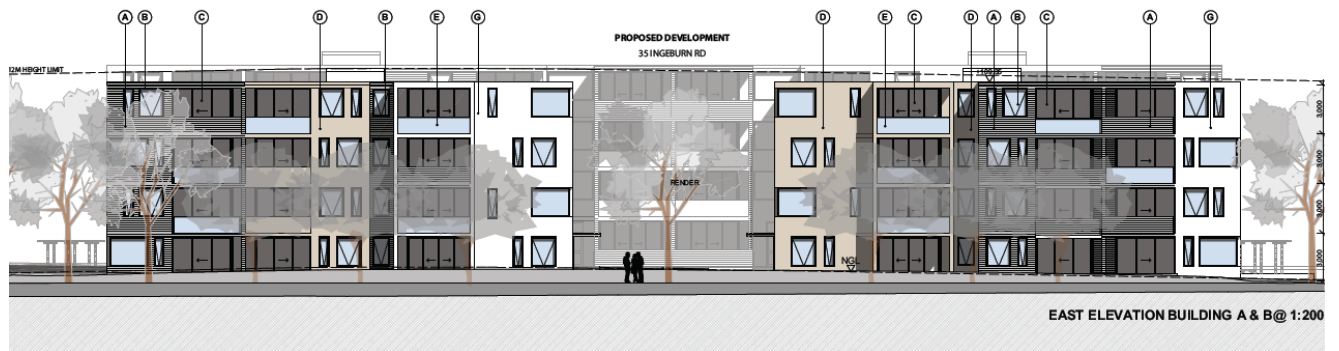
East elevation Building A & B (Ingleburn Road frontage)
